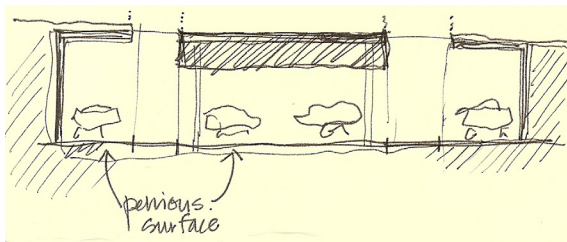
SPACING AND OVERHANG REQUIREMENTS
